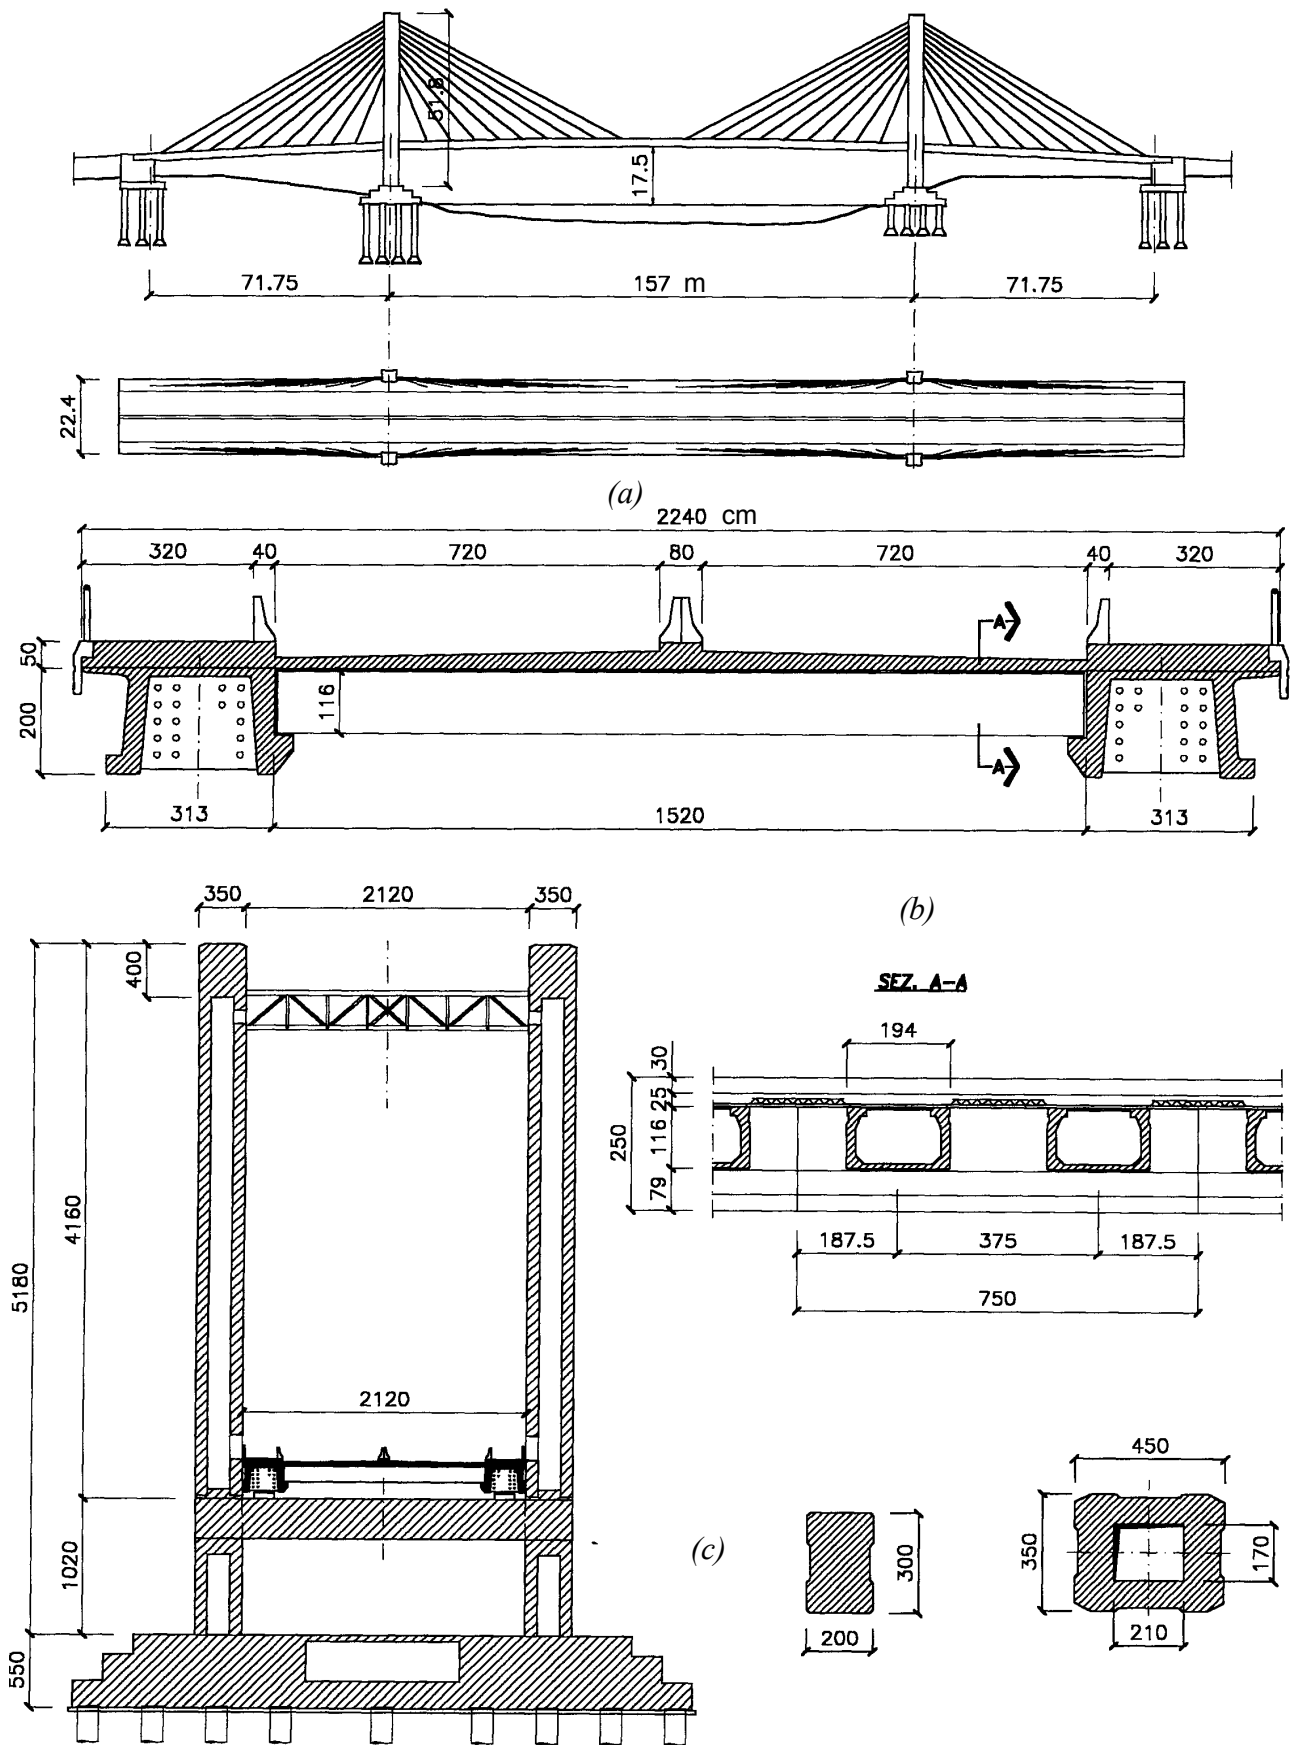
Cable-stayed bridge over Cujaba River in Brazil. (a) Longitudinal view and main geometrical dimensions of the bridge. Sectional views of (b) the deck and (c) the pylons.
